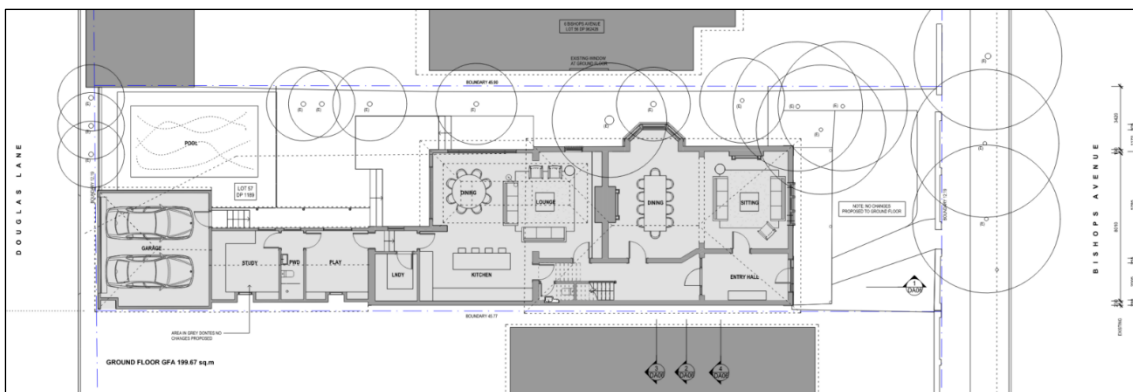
Extracted from Ground Floor Plan (Source: Source Architects Pty Ltd)
